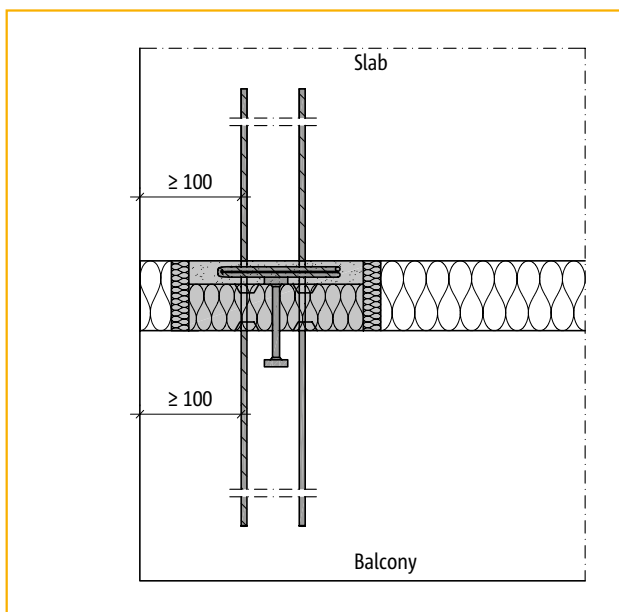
Schöck Isokorb® type RQP elevation edge spacings
